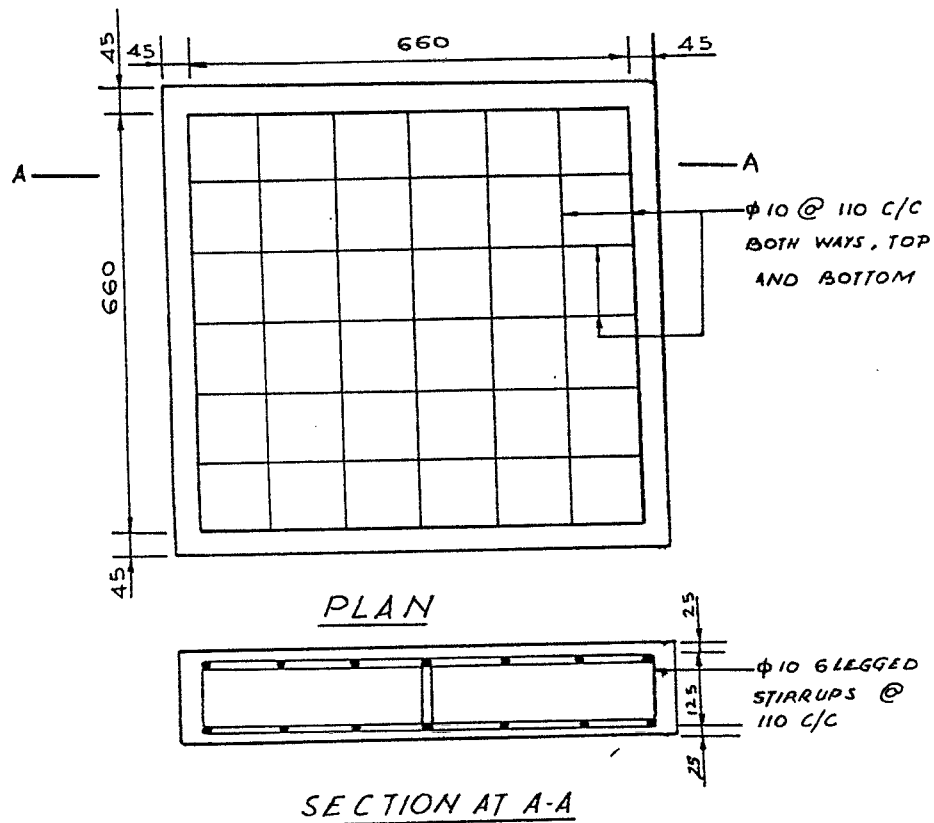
(C) SKETCH SHOWING DETAILS OF SFRC
